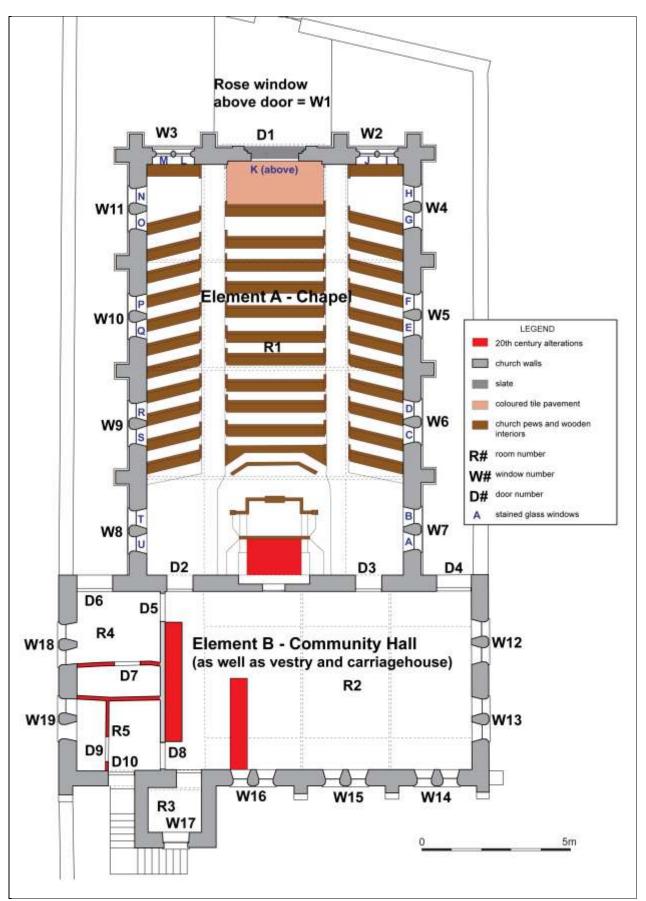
PLAN OF FEATURES AND PHASING ON GROUND FLOOR.
